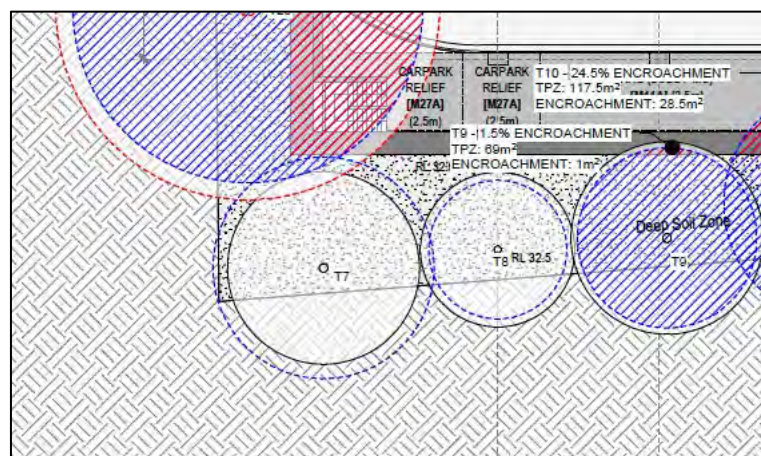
The tree impact plan showing the existing building TPZ conflict of Trees 7 -9 (Source: Lower Ground plan from Preliminary Plans by architectus Rev T – TPZ Overlay, dated 16/05/2025).
